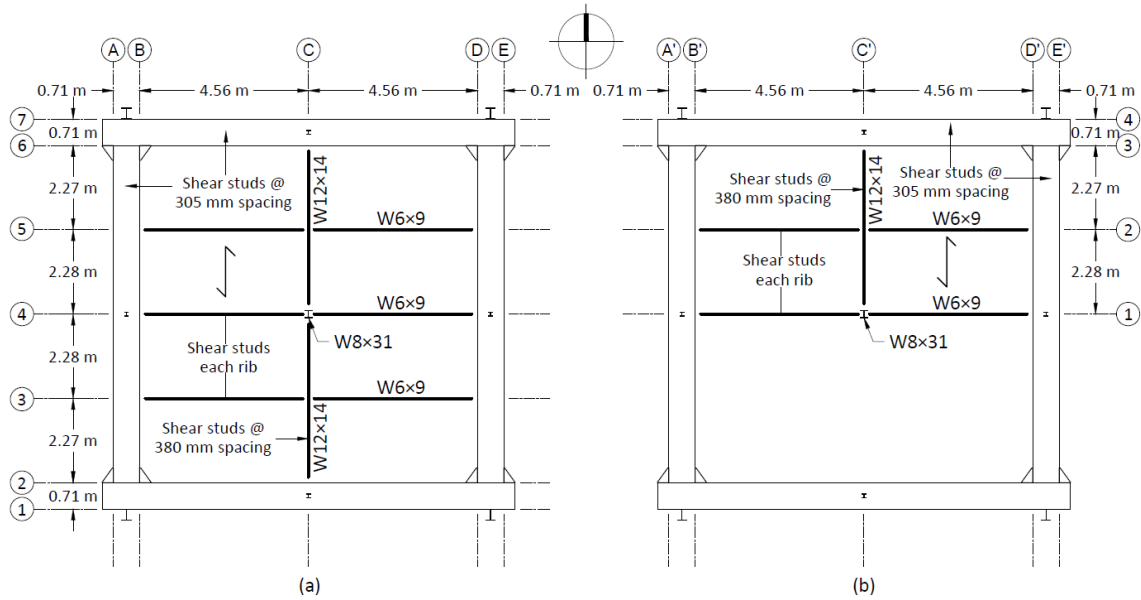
Plan view of the test specimens: (a) ICL specimen, (b) ECL specimen
